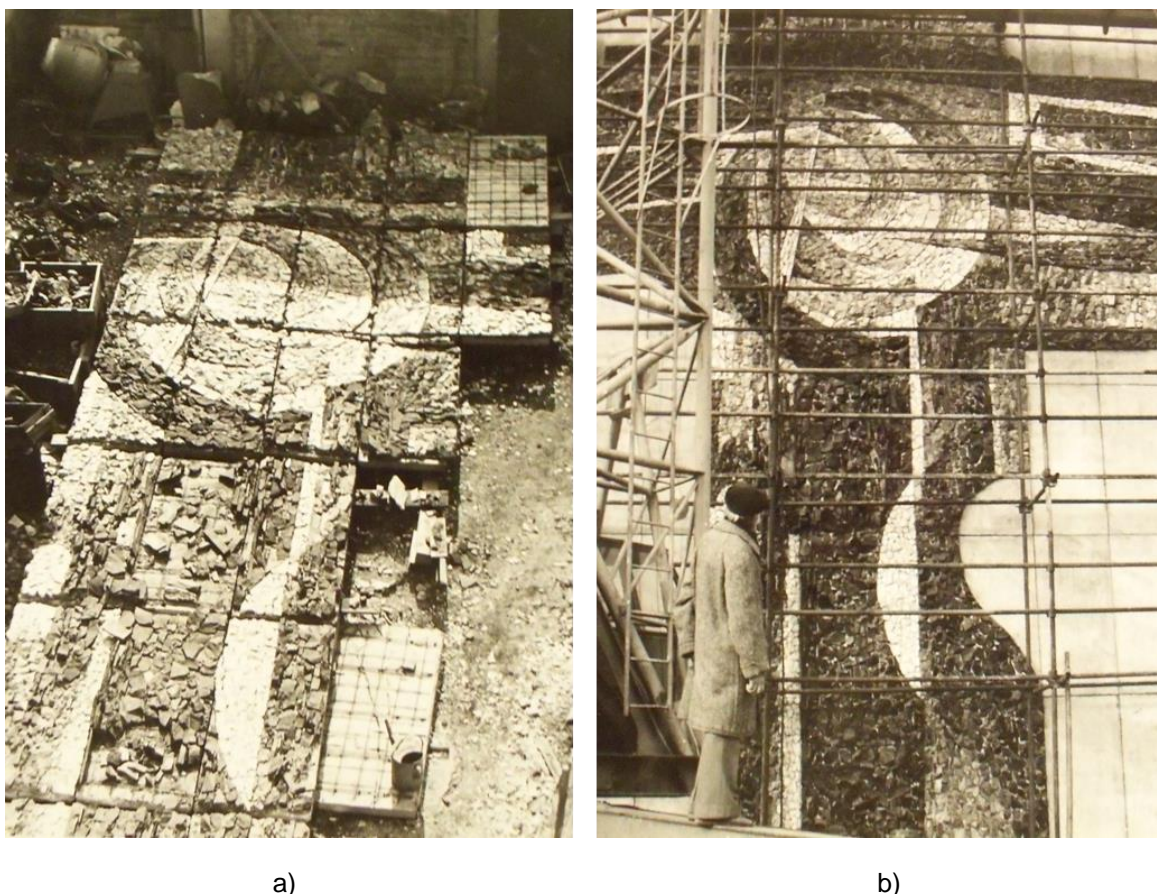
Assembly of the mosaic “Architects’s Reason and Sense” by Martin Sladký. *Alla prima* tesserae laying on frameless slabs in a mosaic studio (a); installation of the slabs on the façade of the Faculty of Civil Engineering. CTU supervised by the author (b). Courtesy of Martin Sladký, Jr. Previously published in [38].
